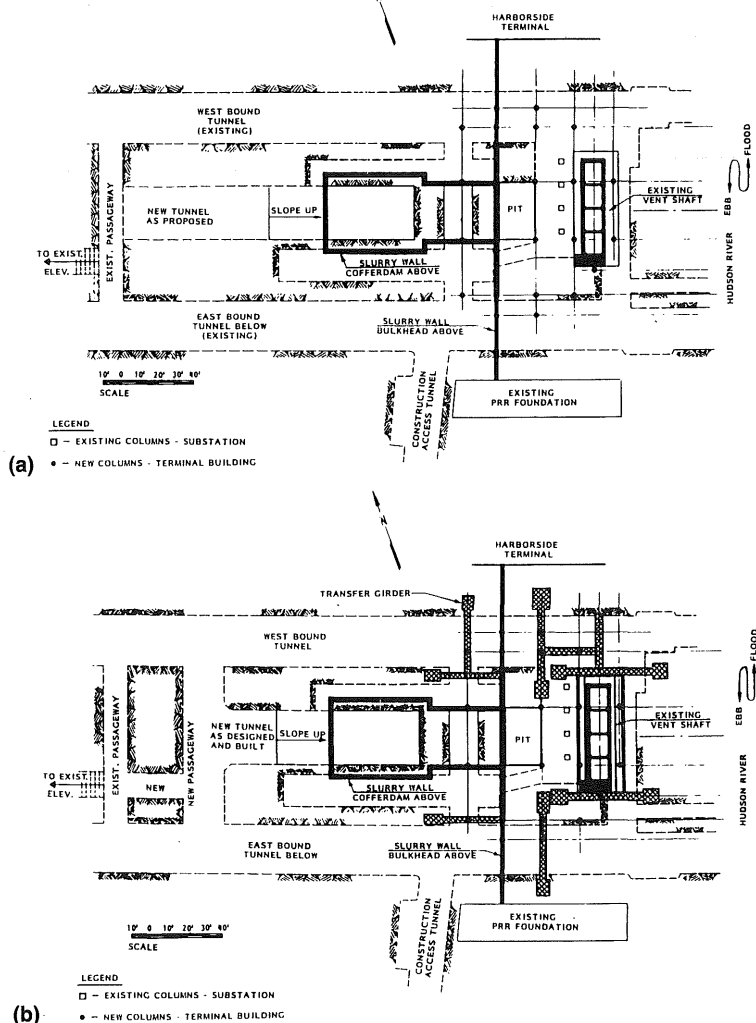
Plan View: (a) as Planned; (b) as Constructed
